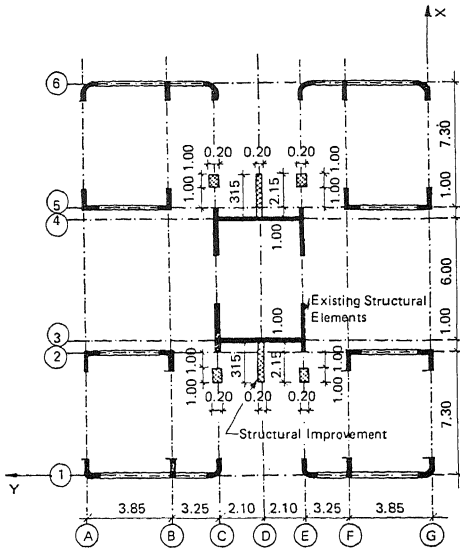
Plan of Typical Floor from Level 11 to 21 of 22 Story Building - Type M, Tlatelolco, Mexico D.F.
